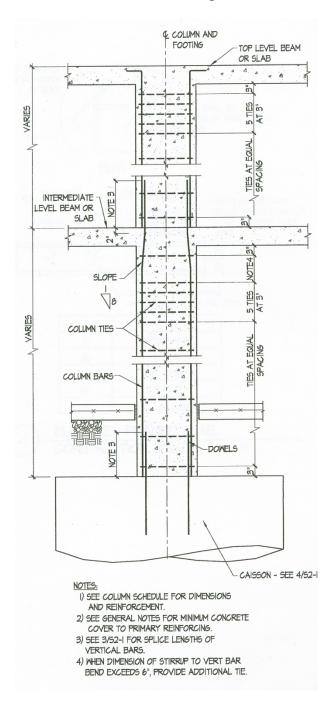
Typical Column Caisson Connection and Column Reinforcing
